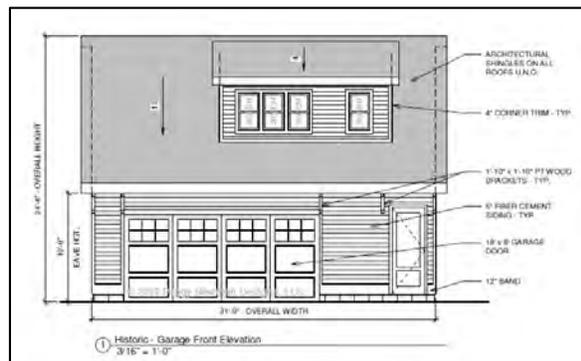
Revised plans that were not presented to MHZC for review. Ridge height is 24'-6", eave height is 10'.
